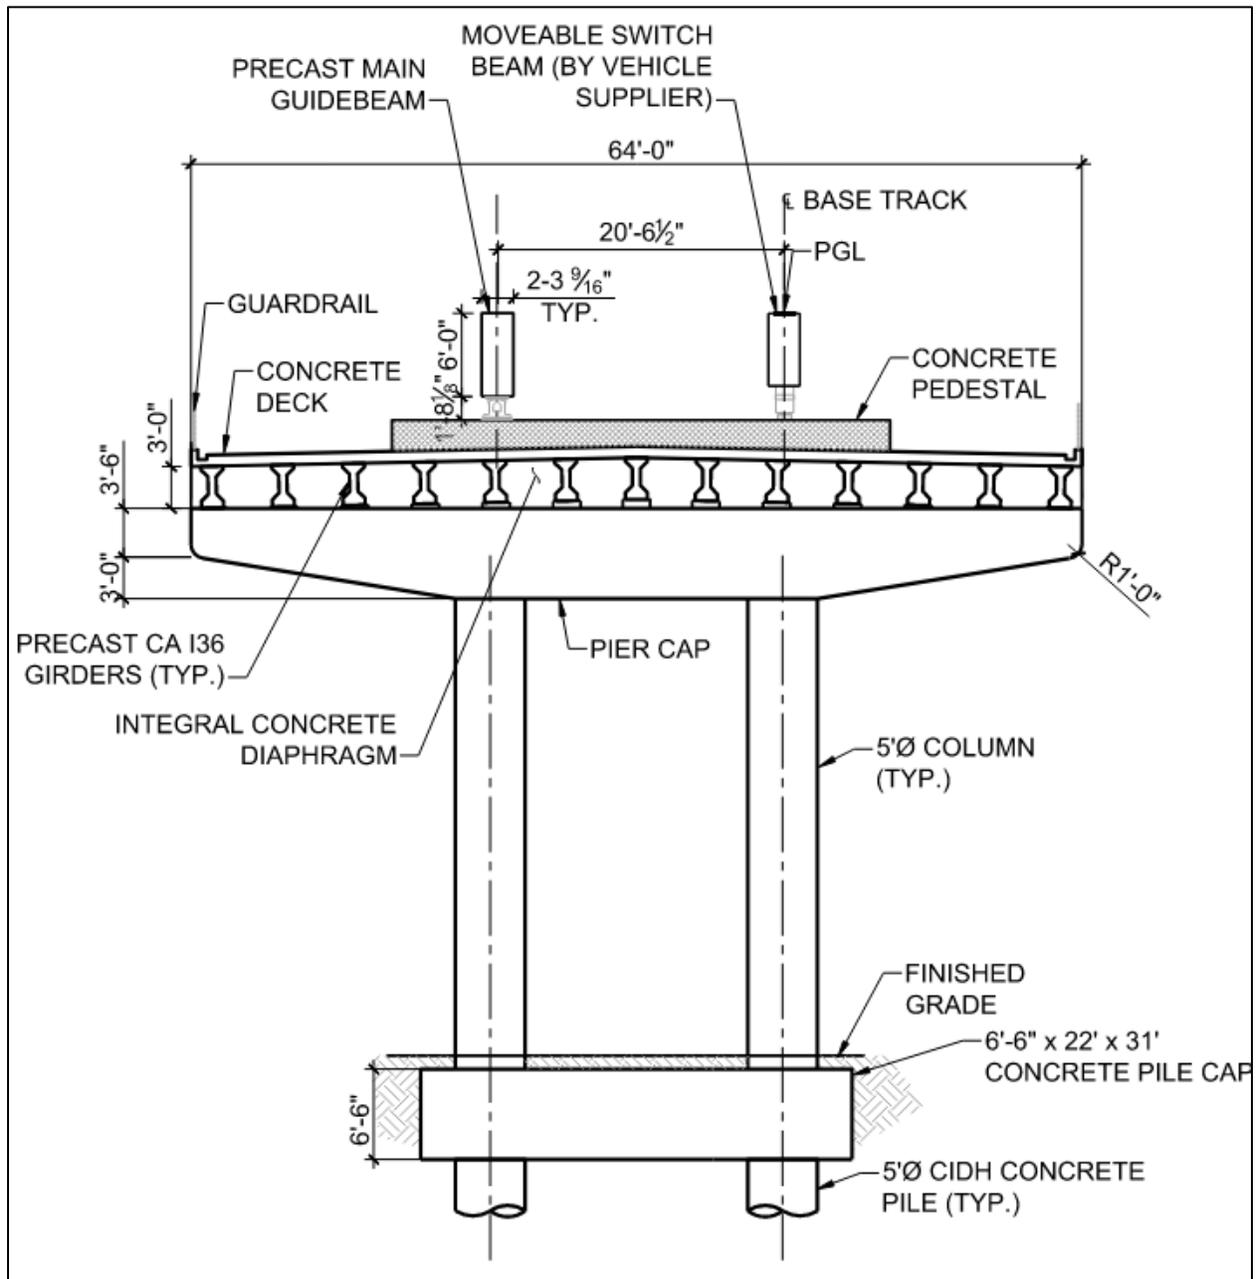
Typical Monorail Straddle Bent Cross-Section
